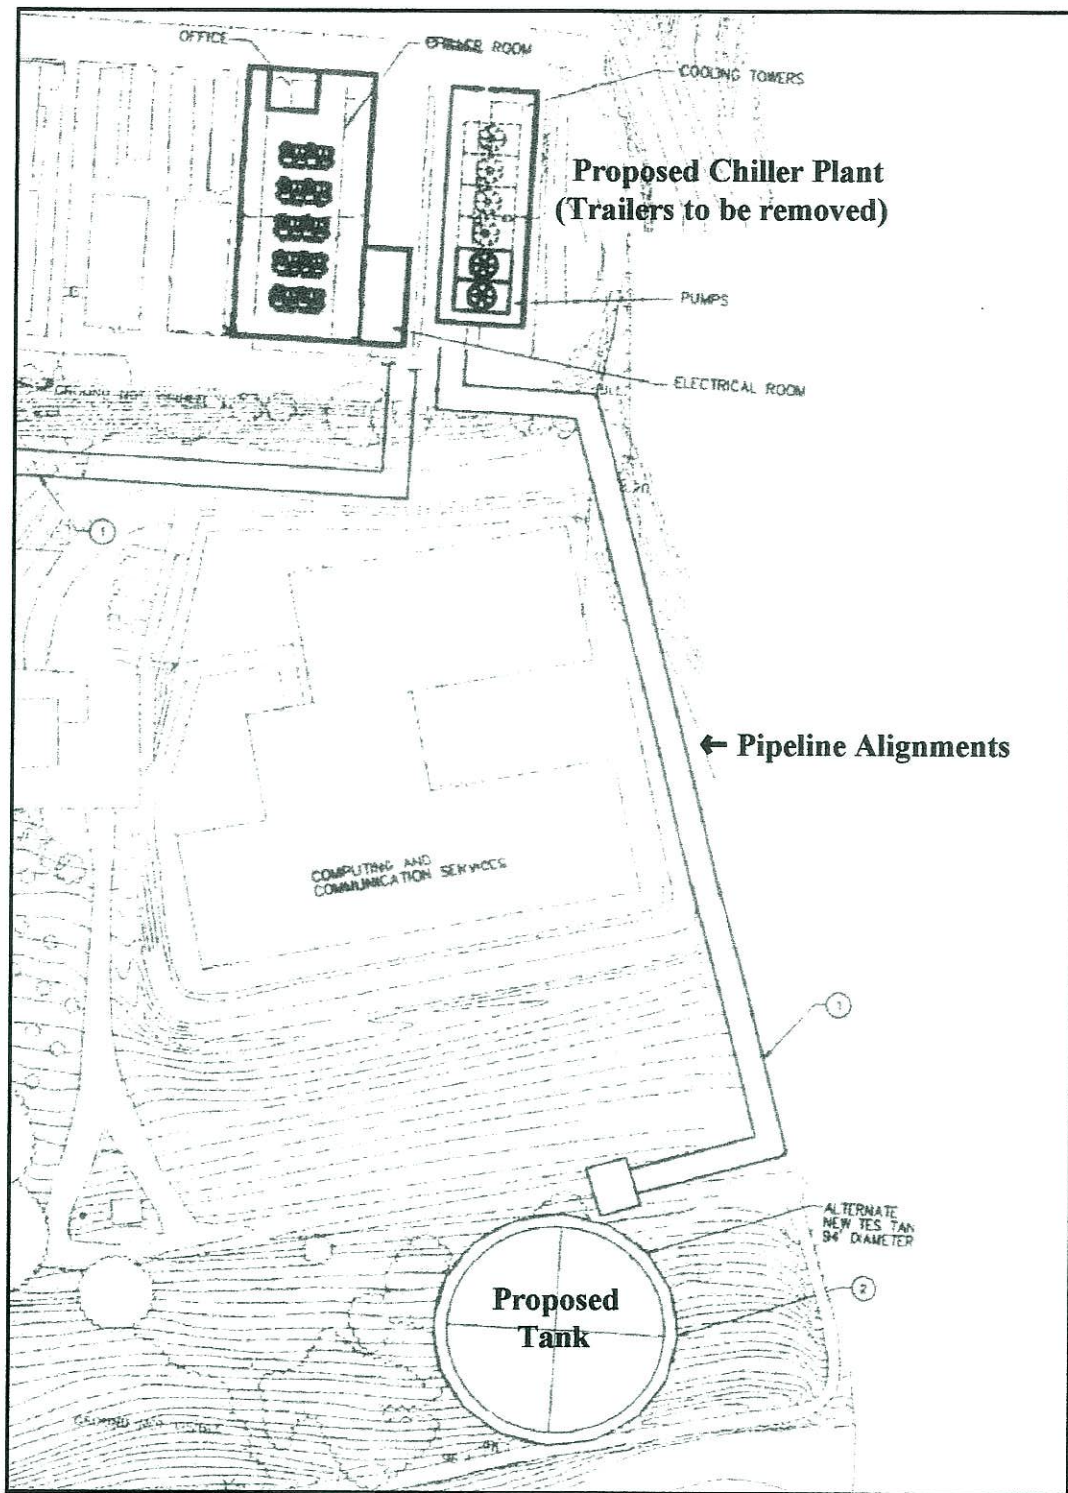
Proposed Facility Design (Tanks and Pipelines).
